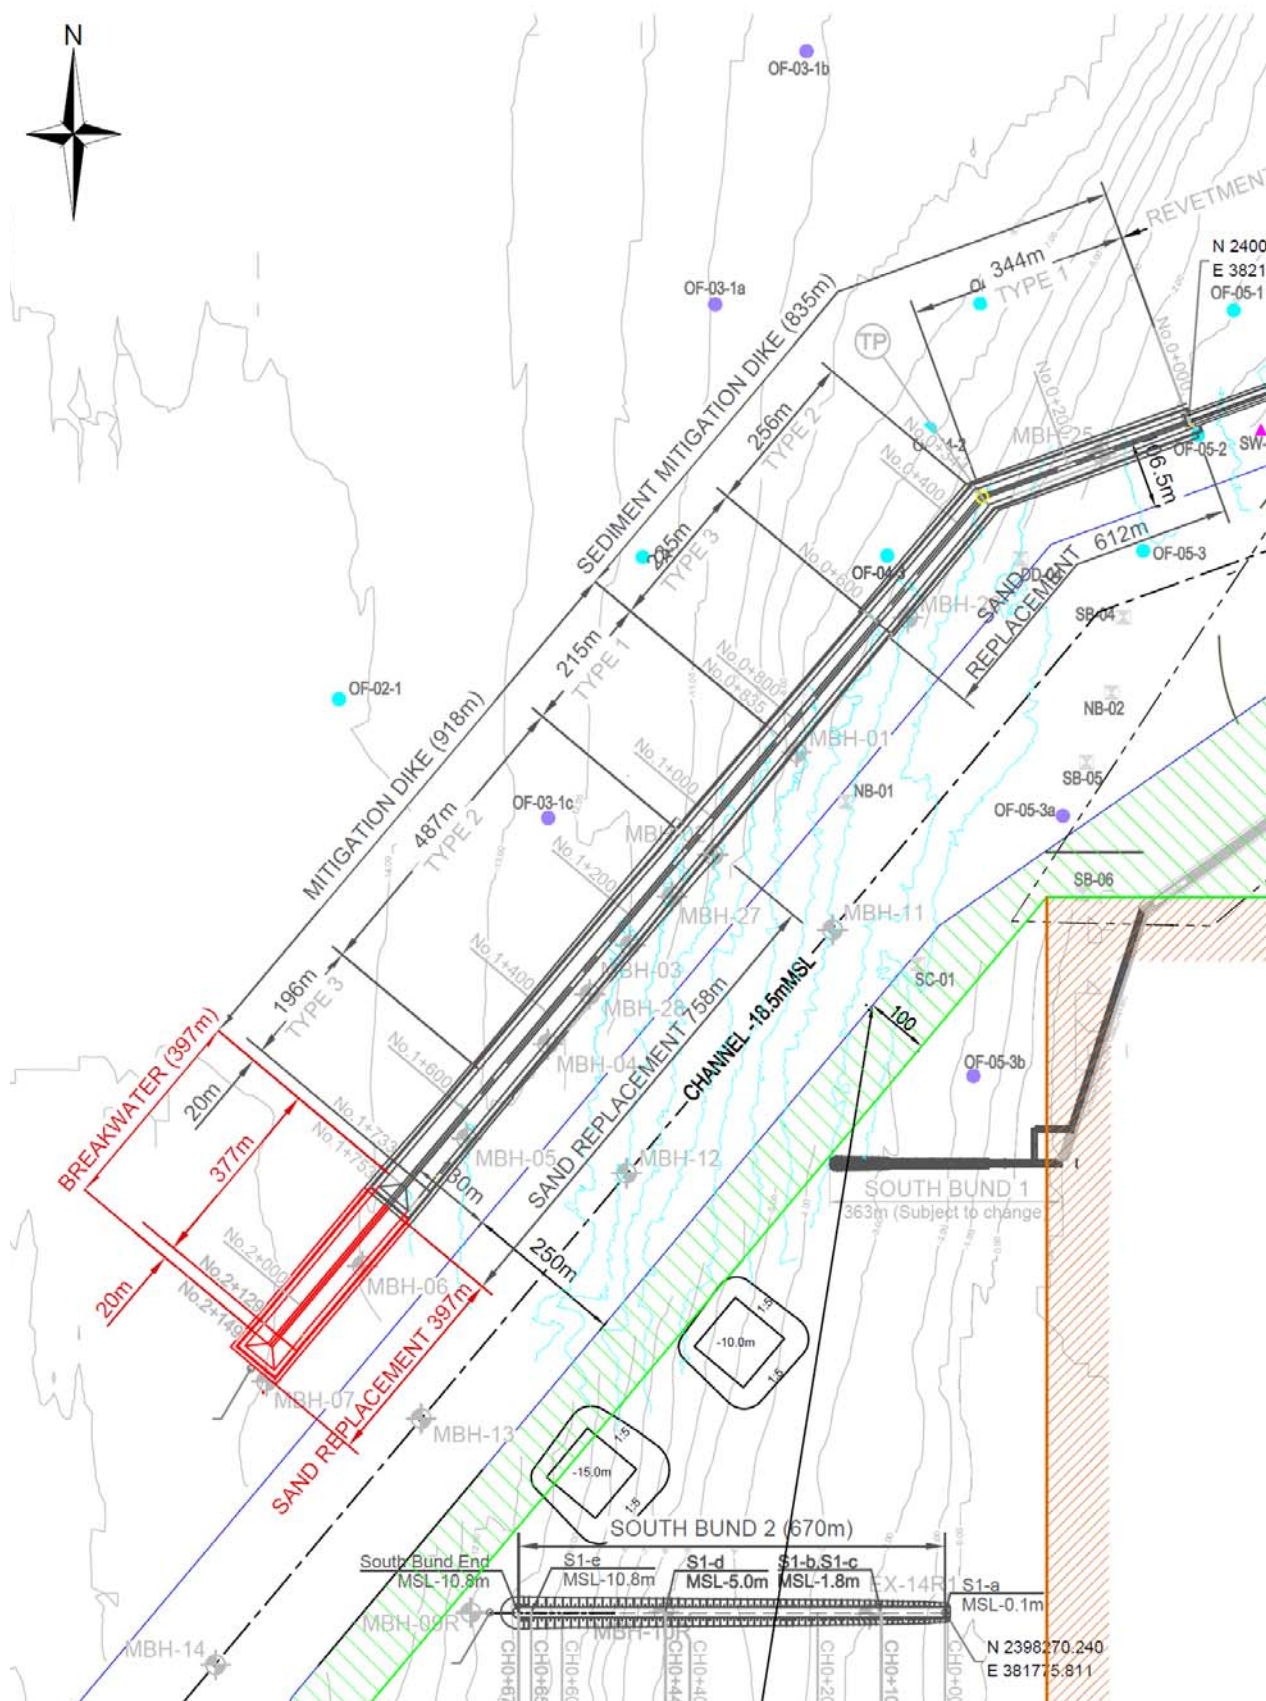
Proposed layout plan of north and south side Dike structure for new port
